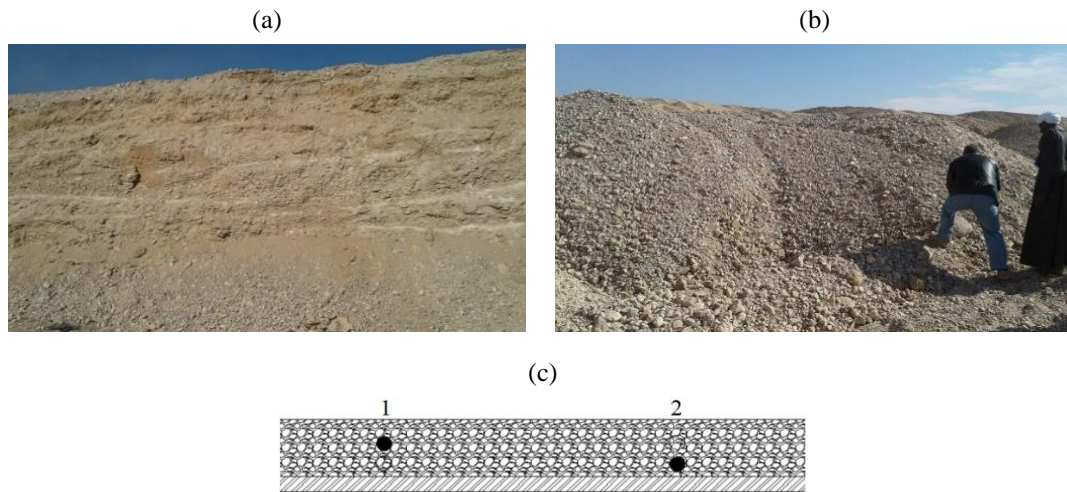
Location of sample procurement for Qus: (a) wall side section 1; (b) wall side section 2; (c) sample location with depth
